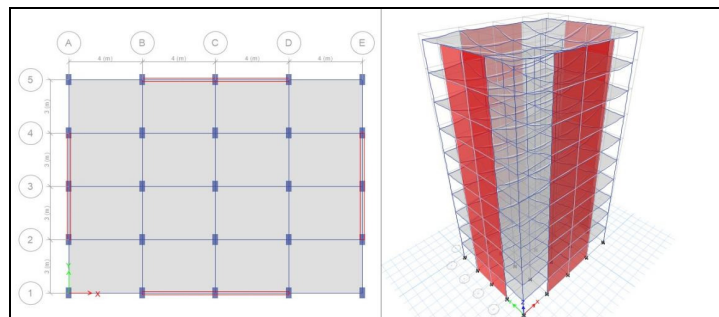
Rectangular pattern frame with shear wall and flat slab
